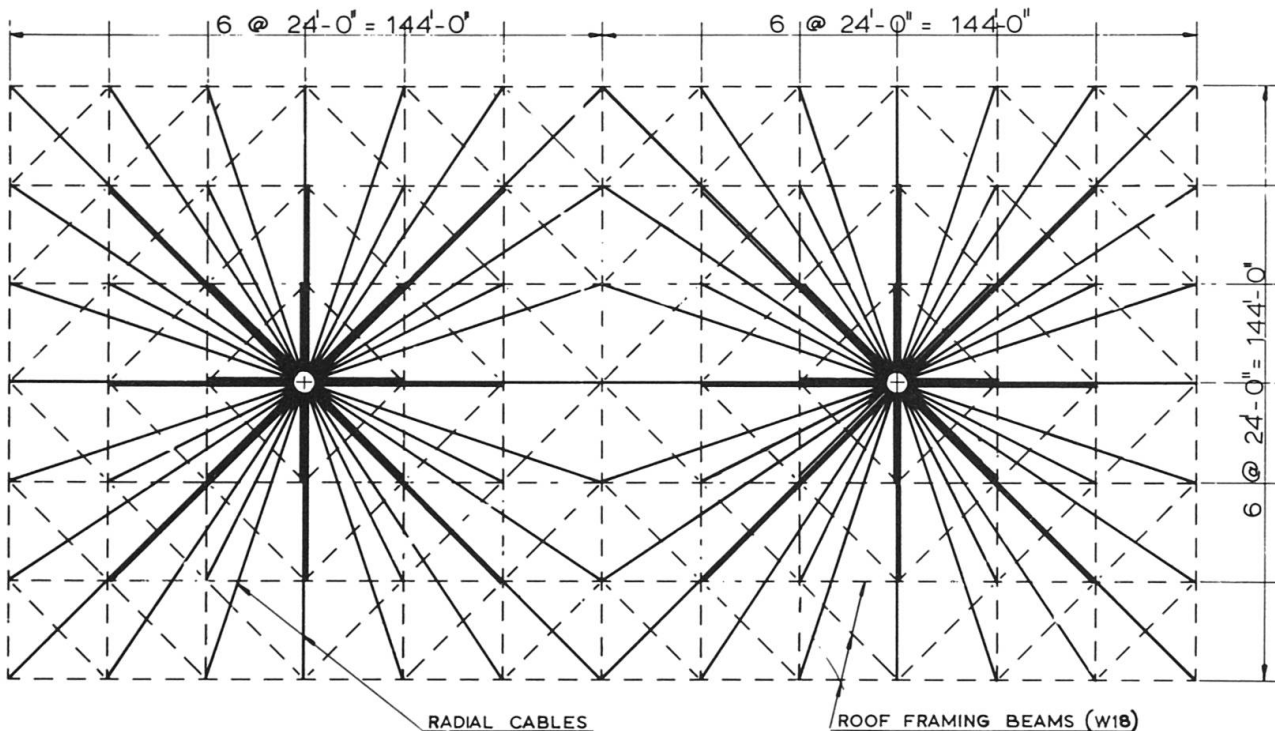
Roof framing and cable plan — Baxter Laboratories Dining Hall
